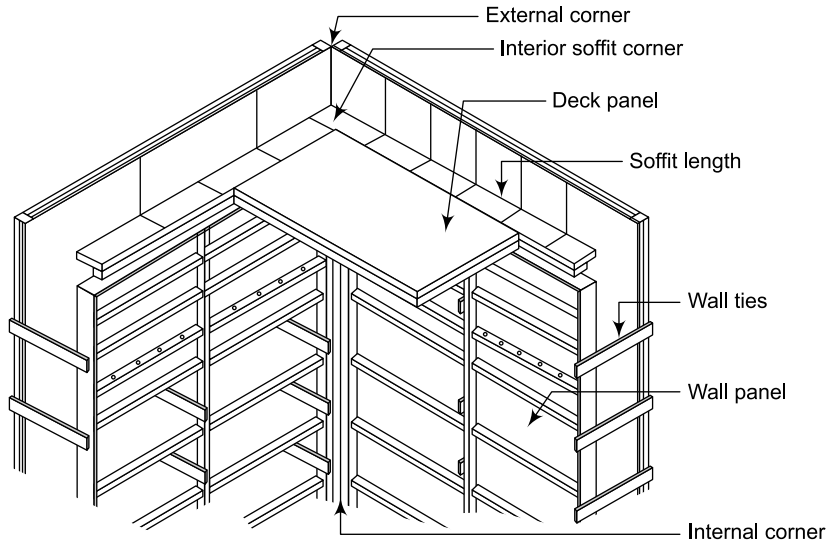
Wall Assembly Details (Courtesy Mivan).
